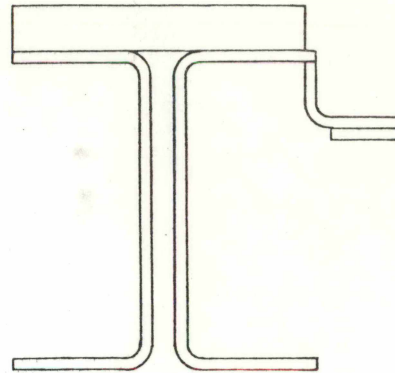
OPEN SHAPE MEMBER CROSS-SECTION
